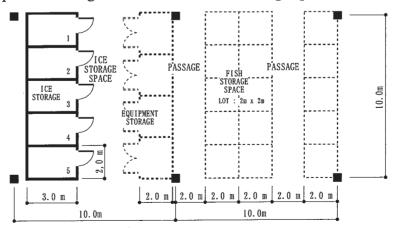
Floor Plan of Ice and Fish Storage Space
